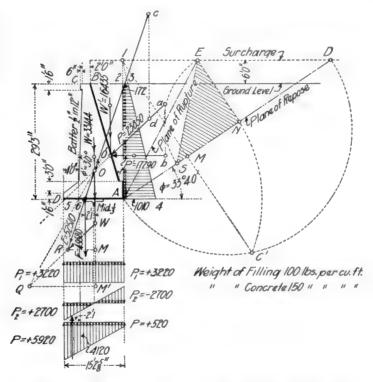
RETAINING WALL, WEST ALAMEDA AVENUE SUBWAY.
